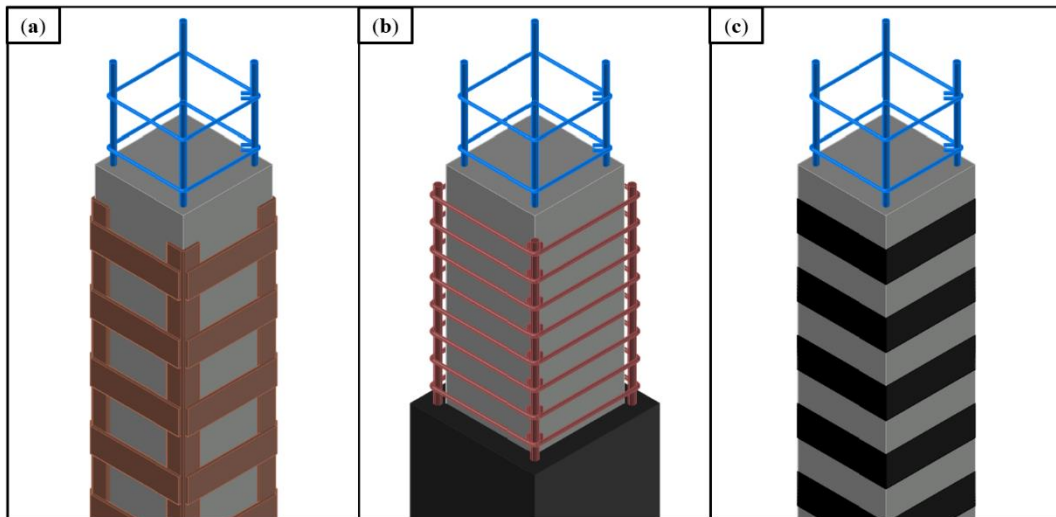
Most common methods for the retrofitting of the RC columns: (a) steel caging system; (b) concrete jacketing; (c) FRP jacketing.
